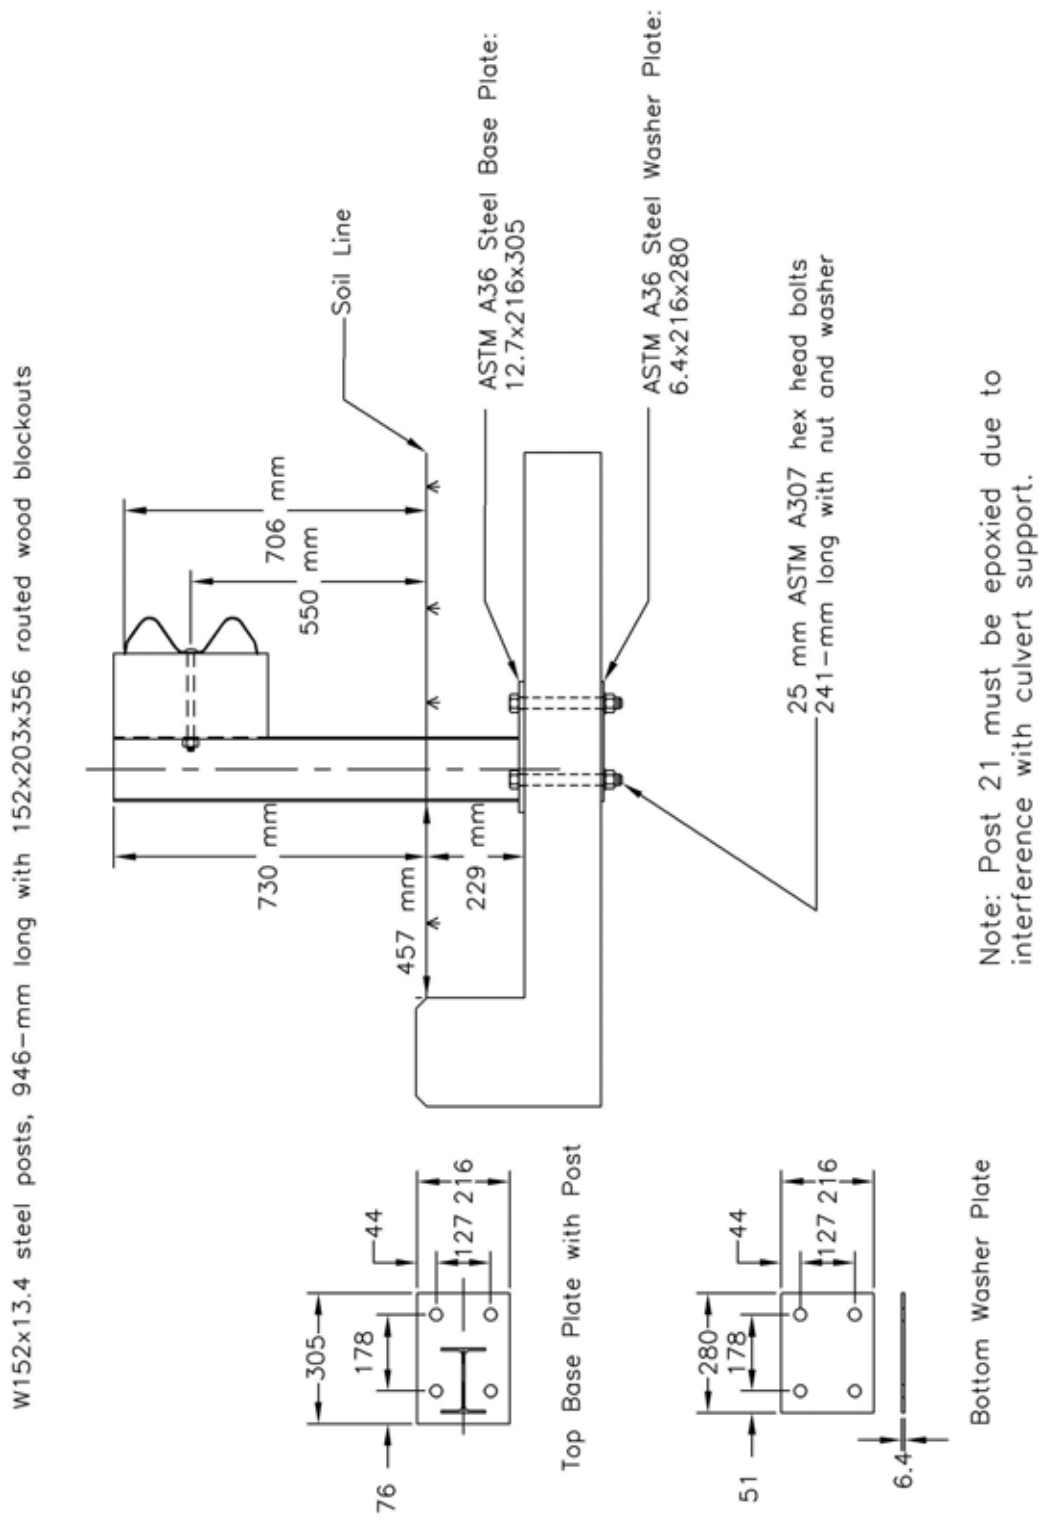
W-Beam Guardrail Attached to a Low-Fill Culvert Post Nos. 15 through 27 (Option No. 1)
